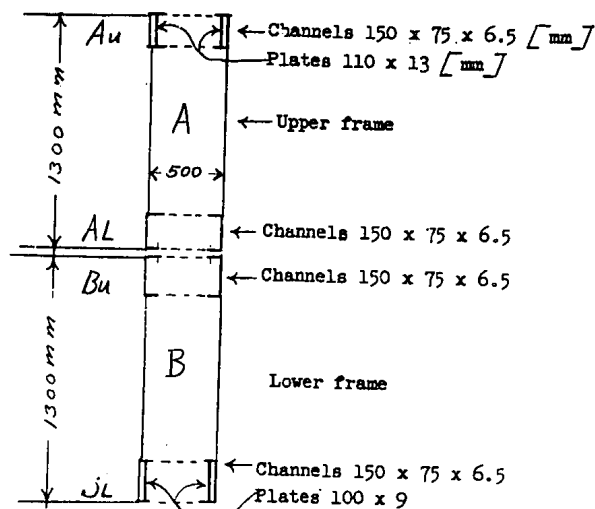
Cross Section of One Longitudinal Beam (Truss Girder) of Upper and Lower Frames of the Japanese Military-Type Bridge Spans (of which there are five or three such beams in each frame)
